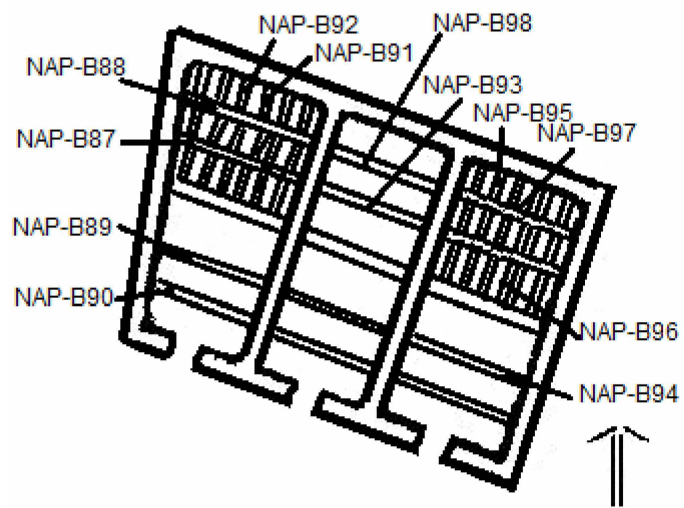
Woodshed, sketch plan showing the location of samples NAP-B87-97
